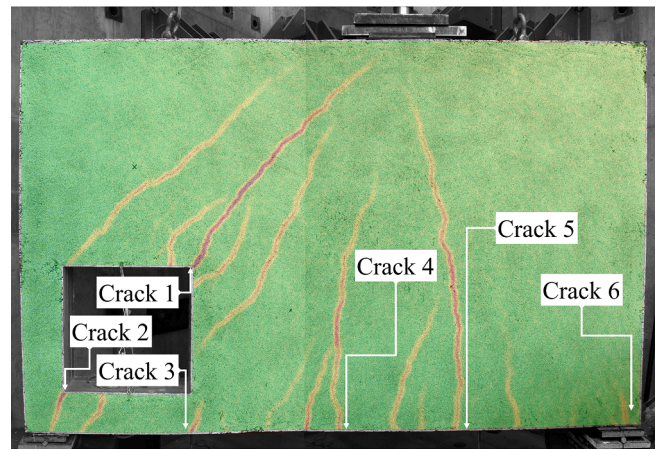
Crack pattern under the load of 1367.1 kN (P_{cru}).
